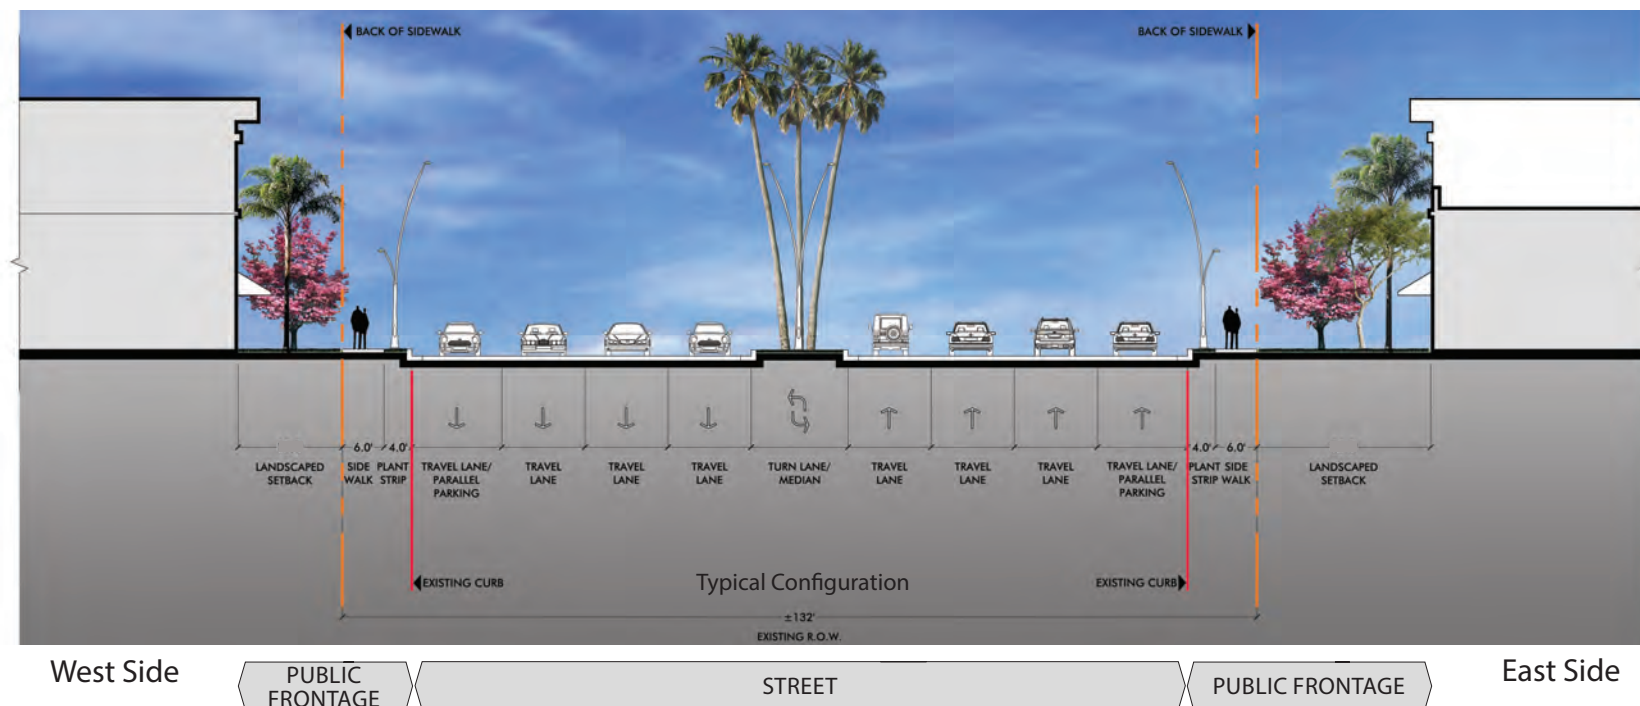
4.)b) Neighborhood Center Streetfront Public Frontage
